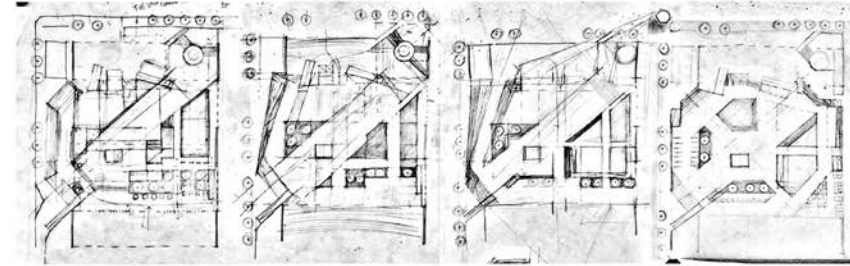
Iterations to resolve the plan of ground floor to correspond with the vertical landscape above (Author 2016)
